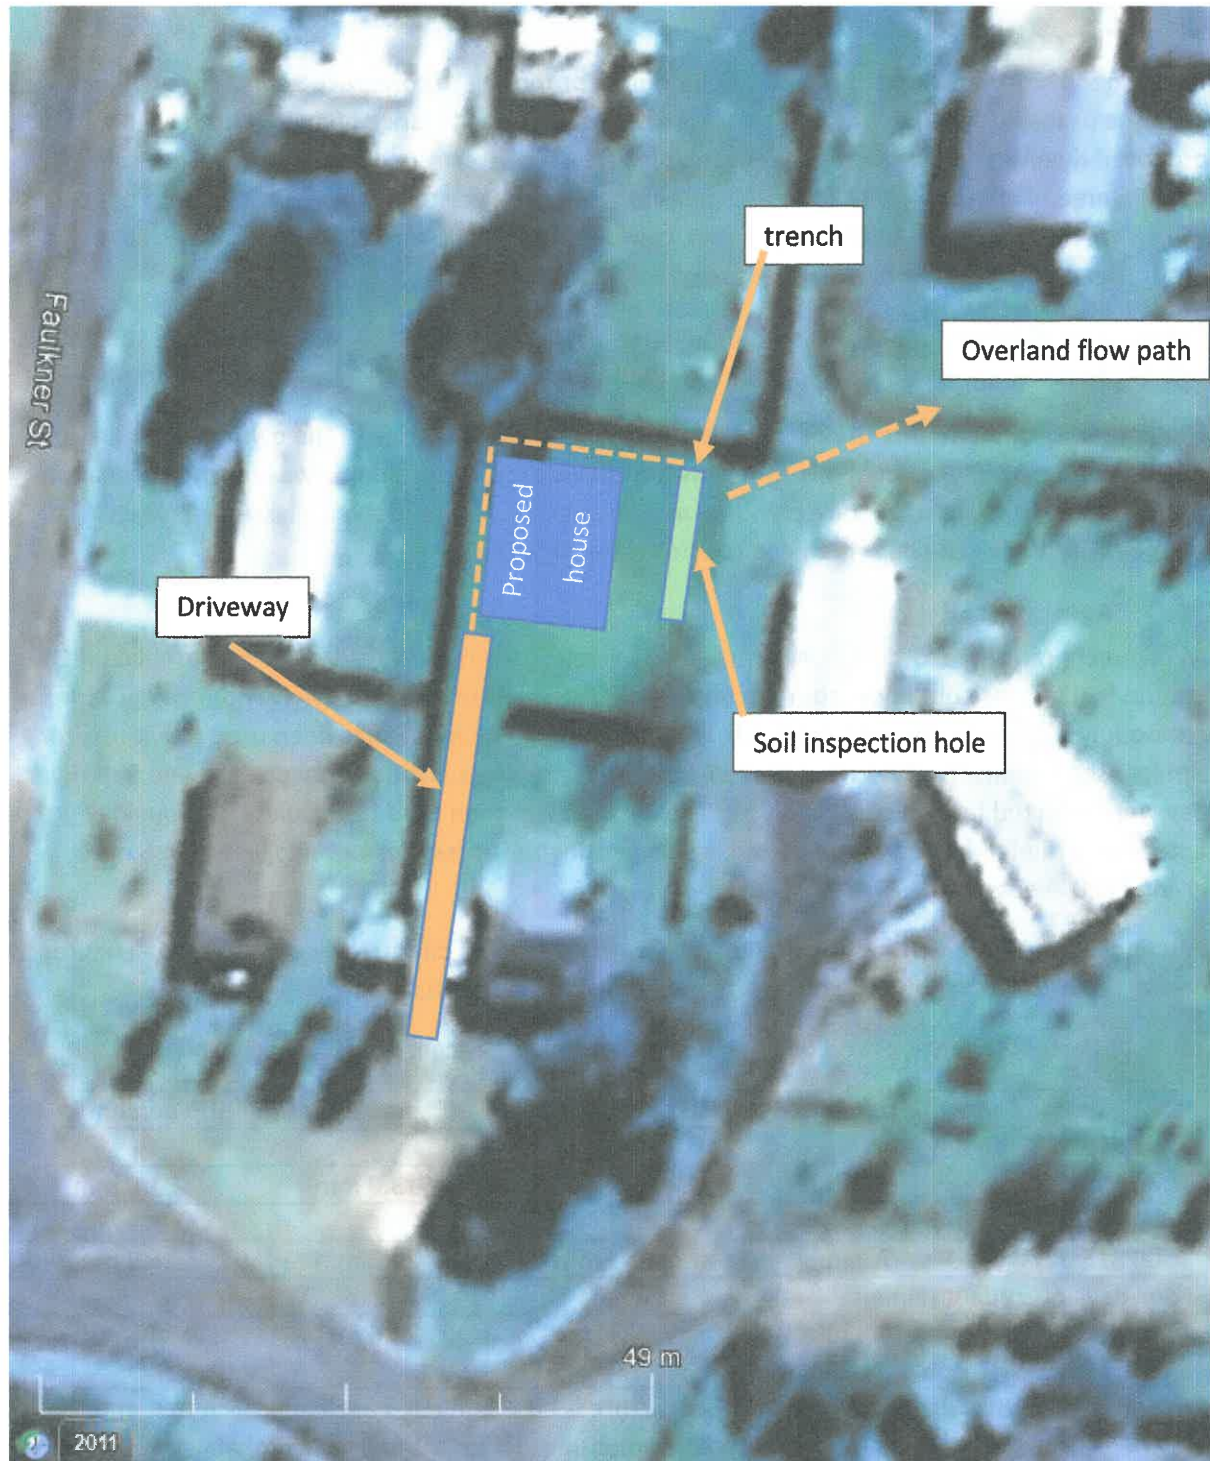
Locality of 51 John Street and proposed driveway, house and sub-soil drainage location
